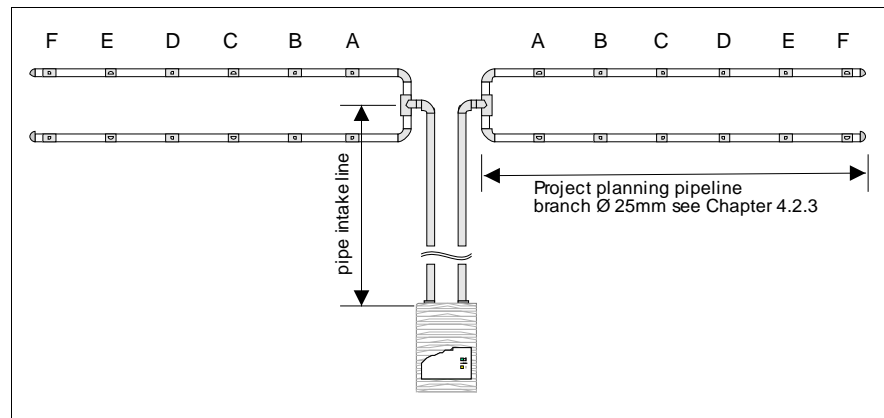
Example of a pipe system for project planning with long pipe intake lines
